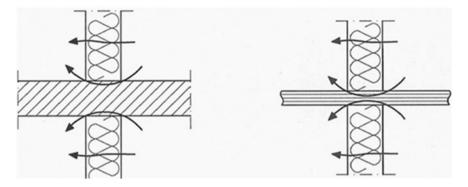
Constructive thermal bridges. Arrows indicate heat flows. (Source: Olsen and Johannesson 1996)
